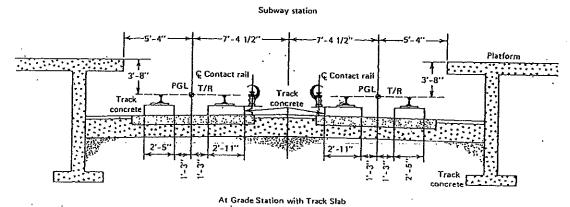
Typical sections of urban rail tracks in stations. (Courtesy Metropolitan Atlanta Rapid Transit Authority.)
